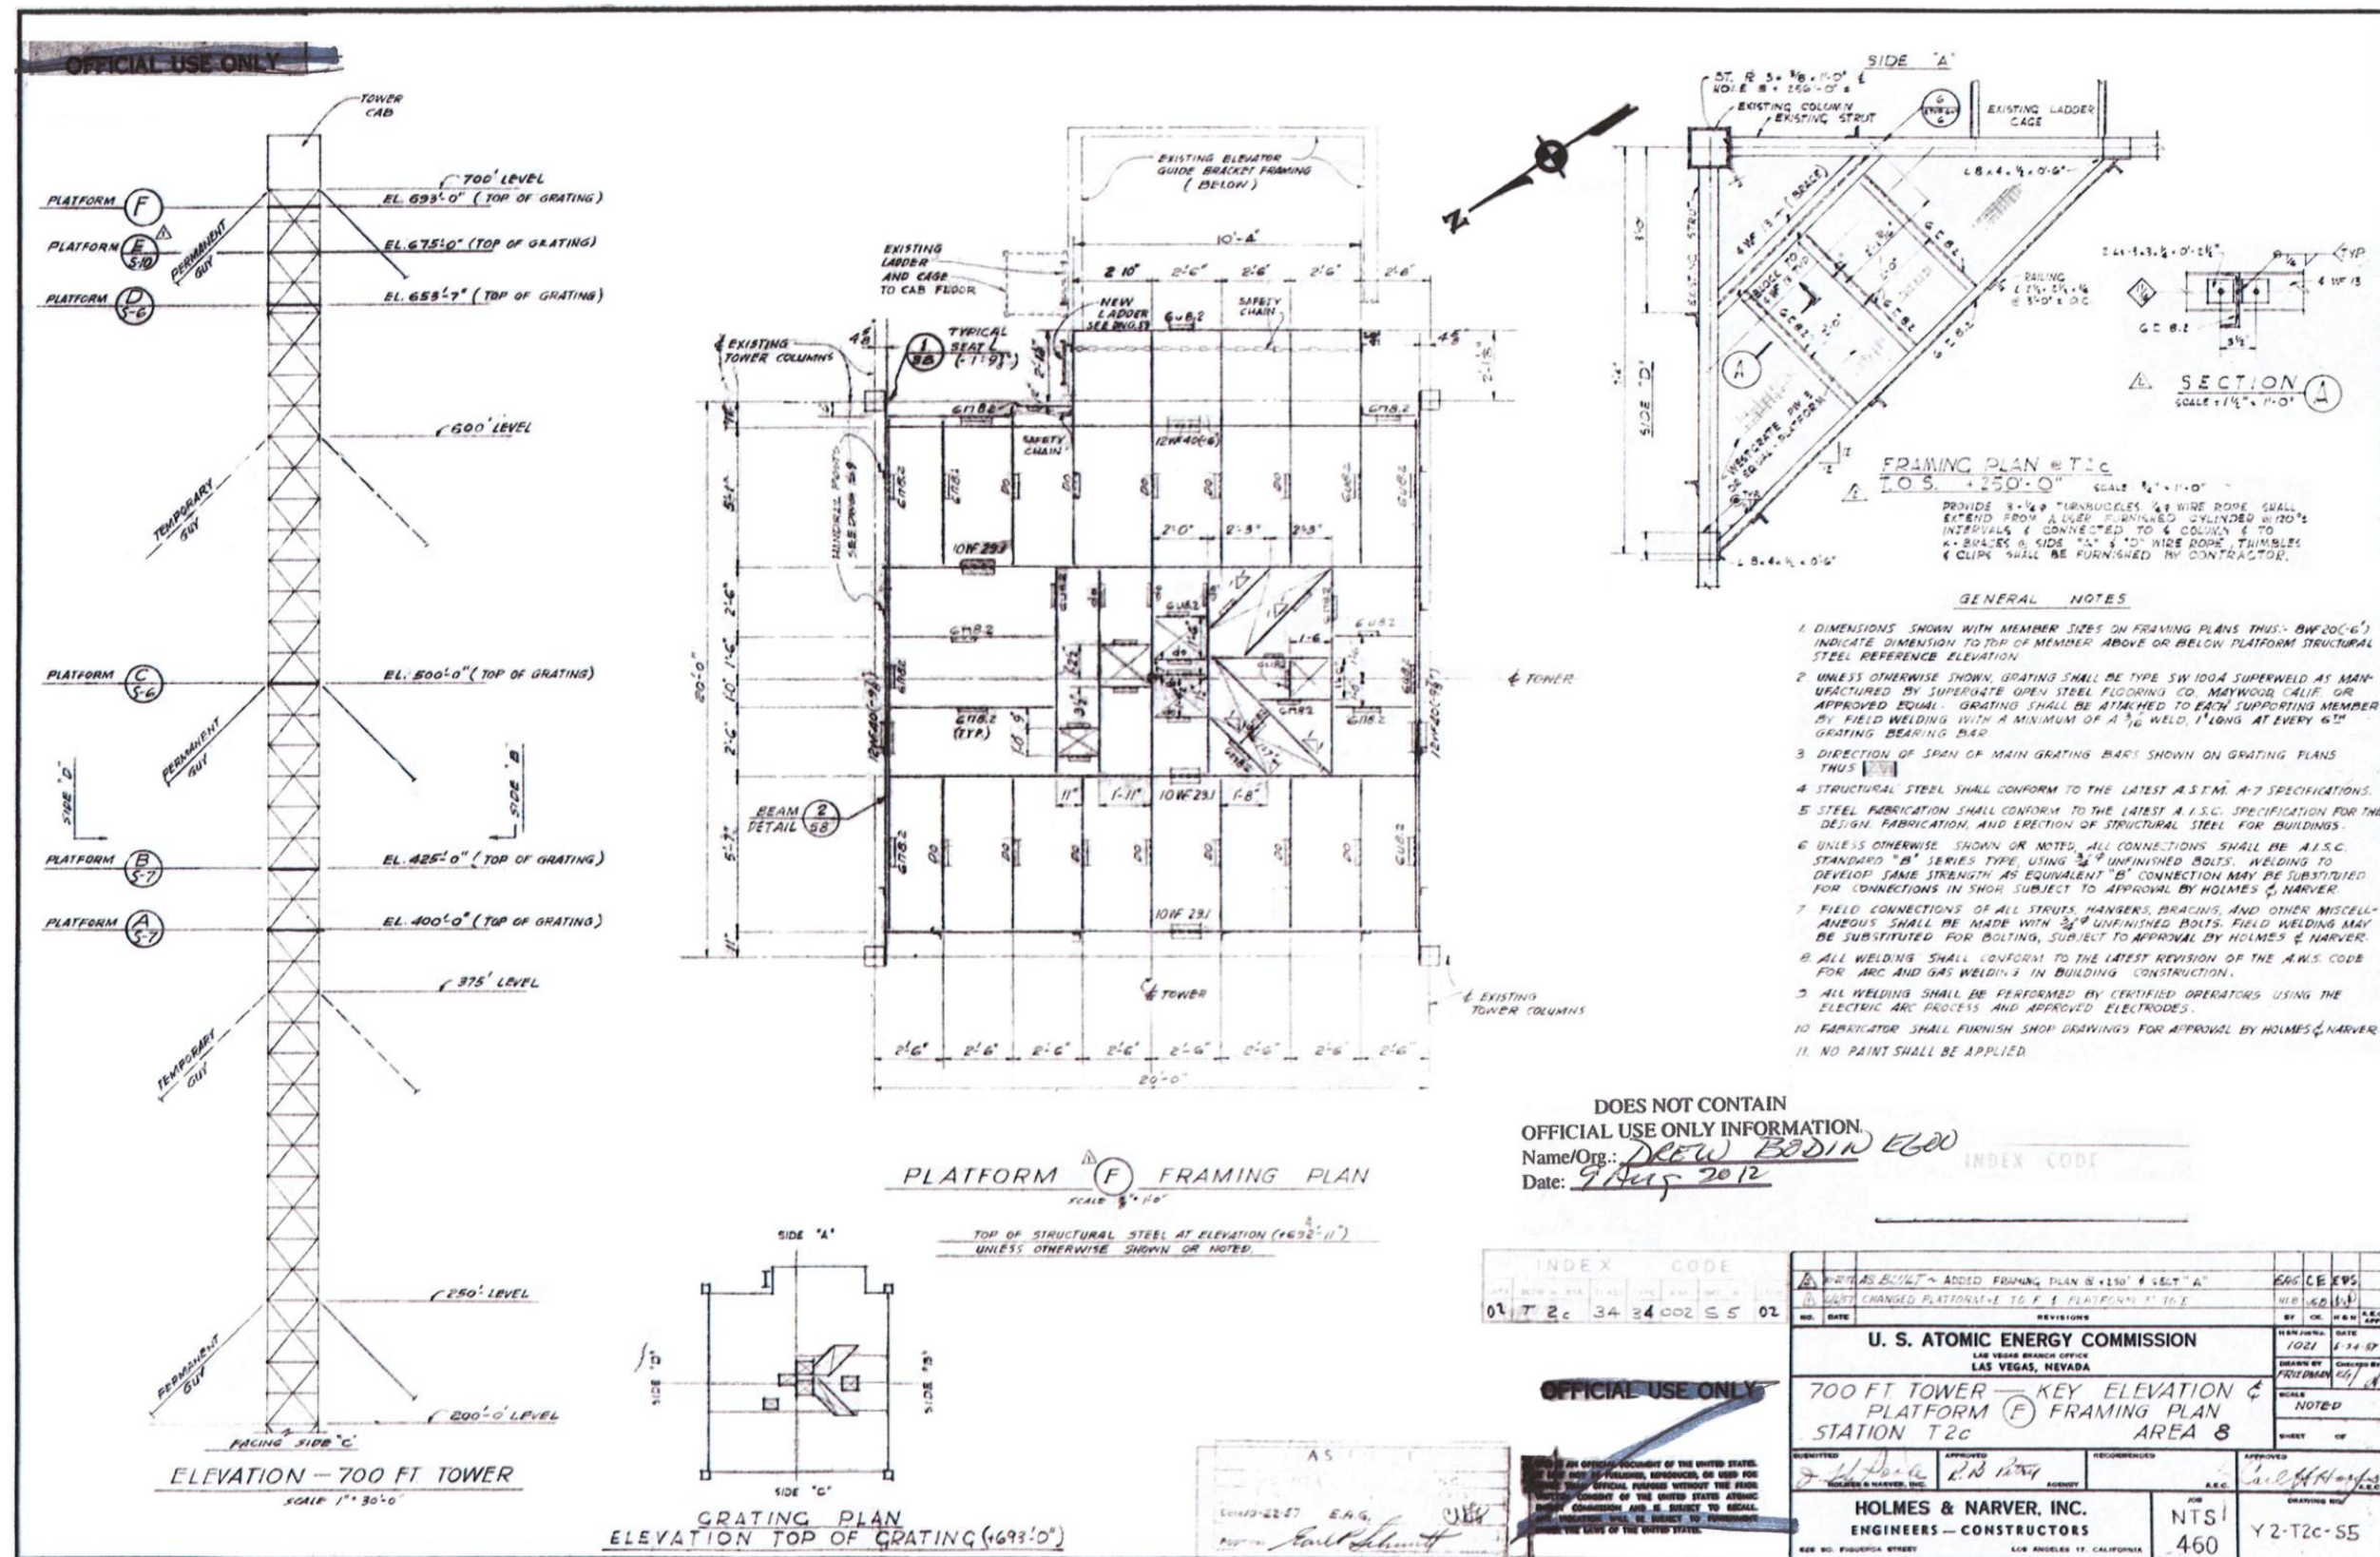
Smoky 700 ft tower key elevation and platform framing plan.
